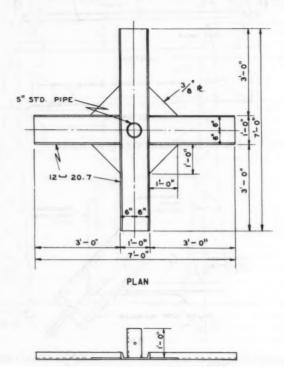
BASE FOR HOISTING RIG COLUMN
